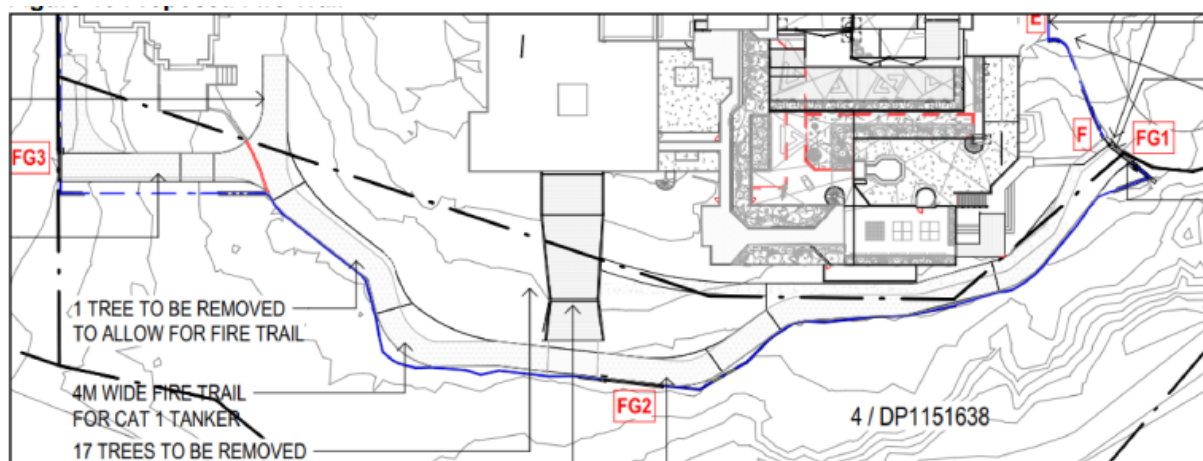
| Location of propose fire trail (Source: Supplementary RtS)
